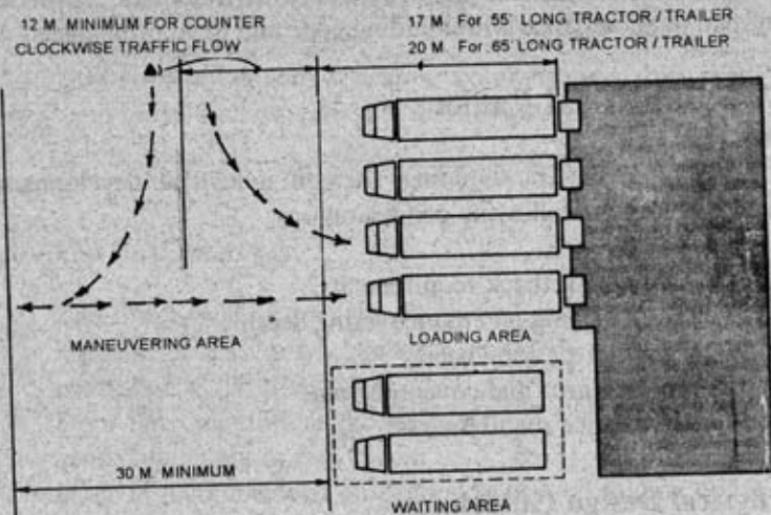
TRUCK LOADING AND MANEUVERING LAYOUT
